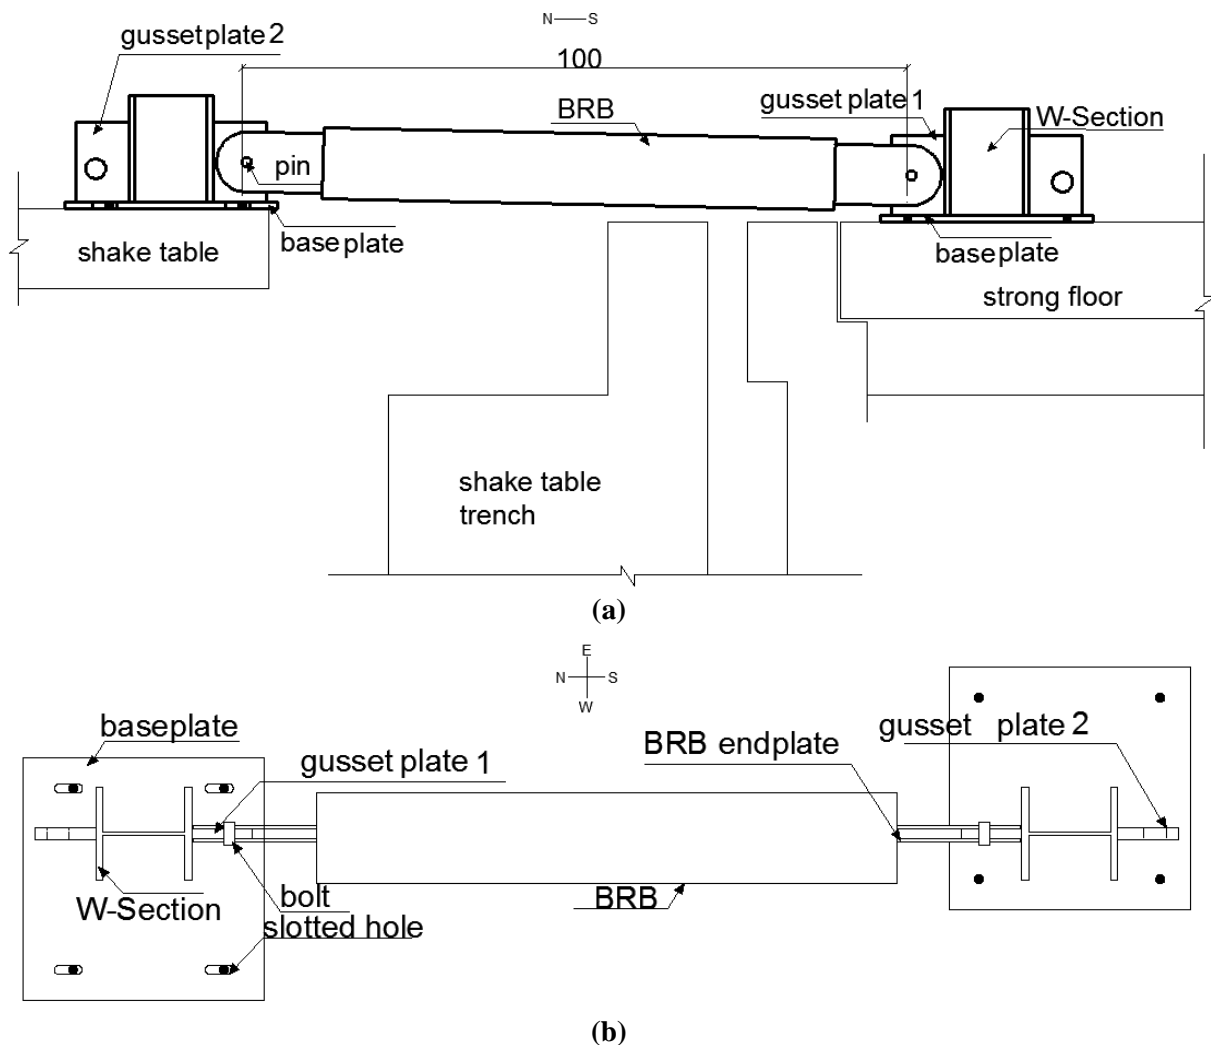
Test set-up layout with BRB; (a) side view (b) top view
